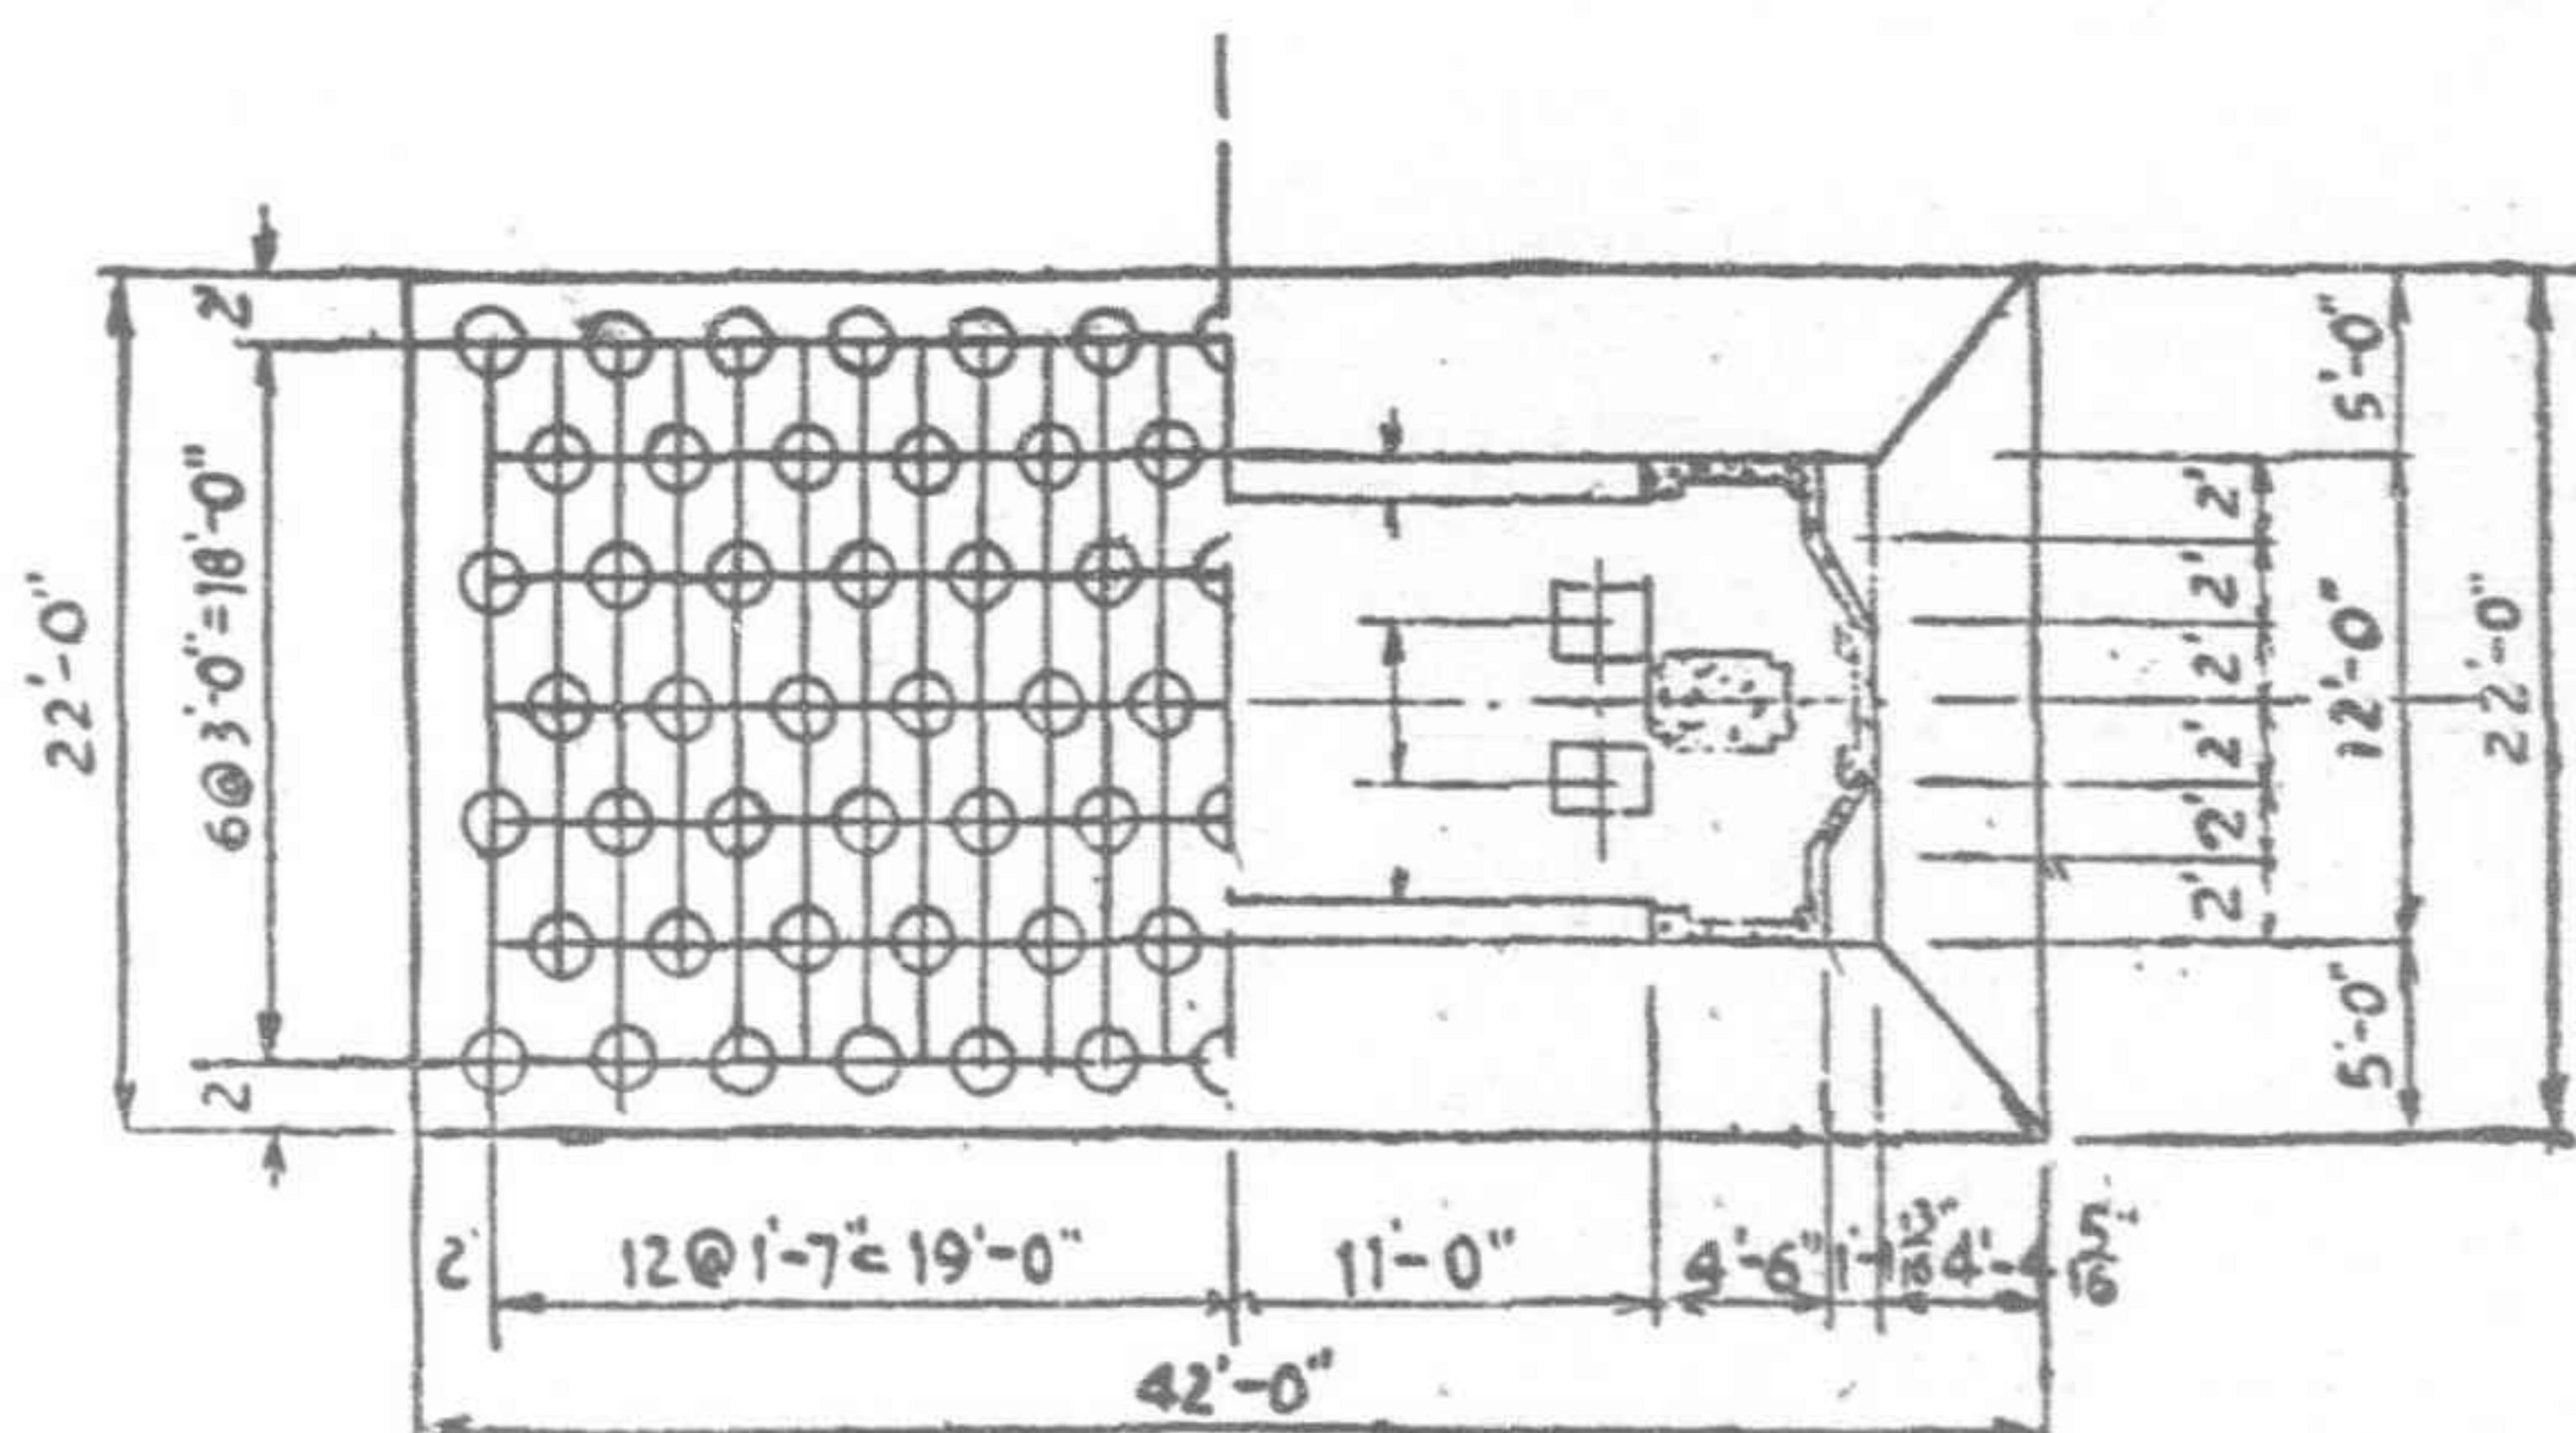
The pile foundation process for the laying of piers C1 and C2
